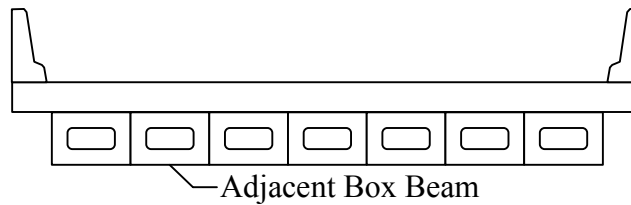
PS CONCRETE ADJACENT BOX BEAM
